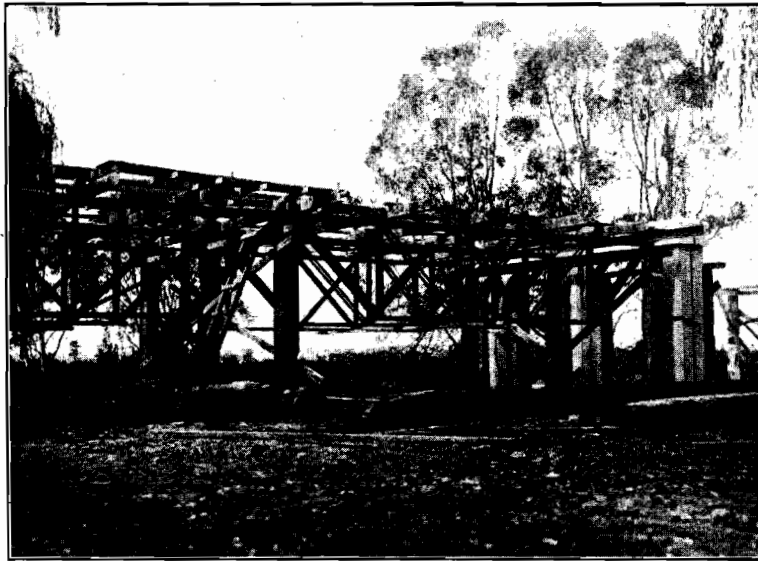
Showing Arrangement of Light Steel Trusses at Rosedale.
